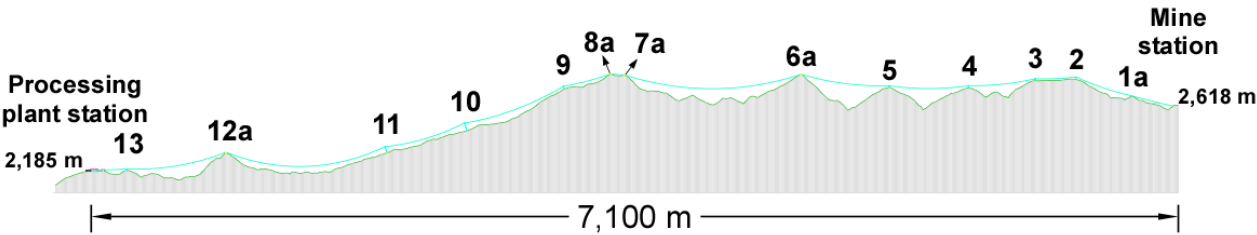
Long section of the rope conveyor system route – adapted from Doppelmayr 2025
